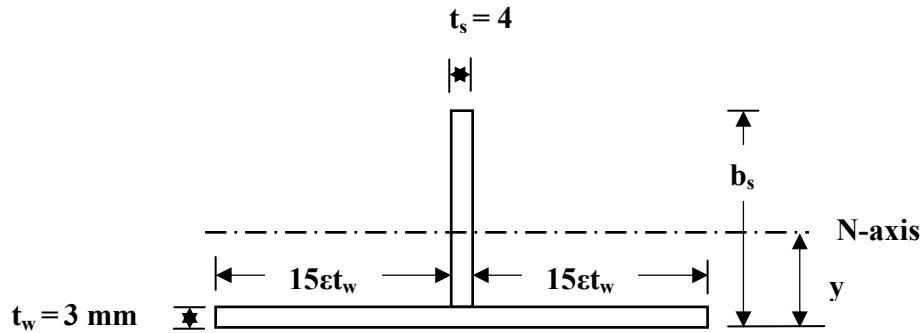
Required cross-section of intermediate steel stiffener for specimen B5
